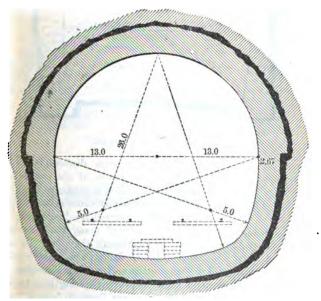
HOOSAC TUNNEL SECTION THROUGH SOFT GROUND.
